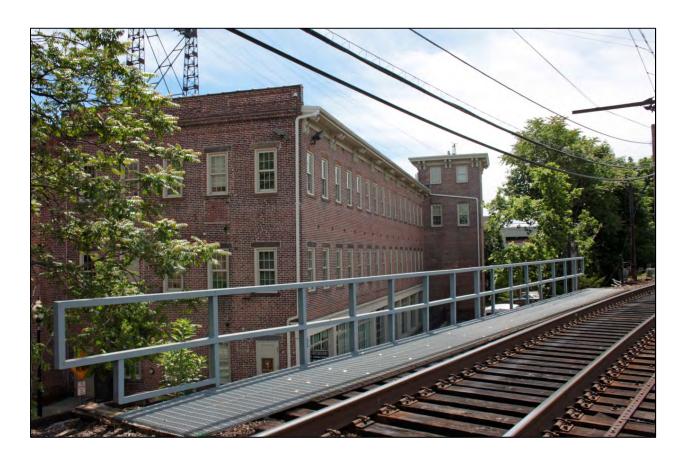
Retaining wall, south of Ann Street, camera facing southeast.
